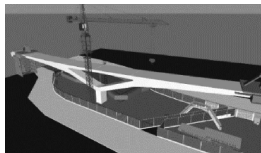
Site layout of Y-shaped structure support system of bridge in Heshu interval
